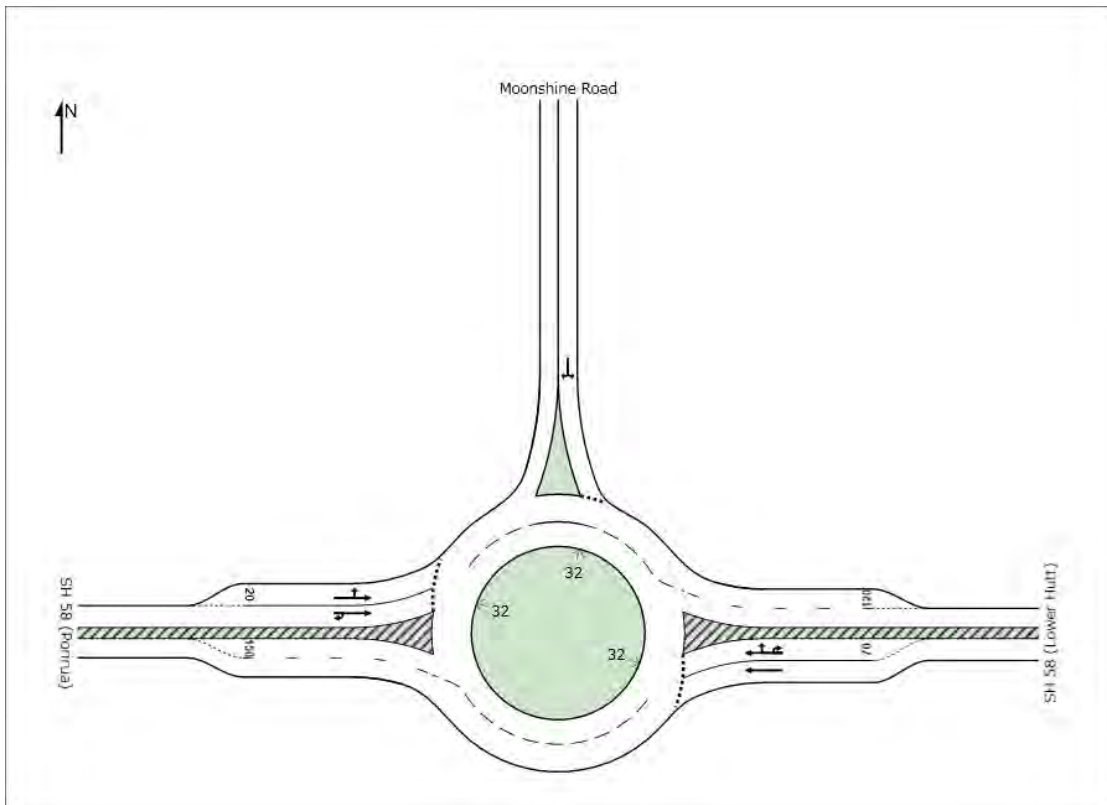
Moonshine Road Roundabout Layout (Final Option 4 – Road Safety Audit Update)
